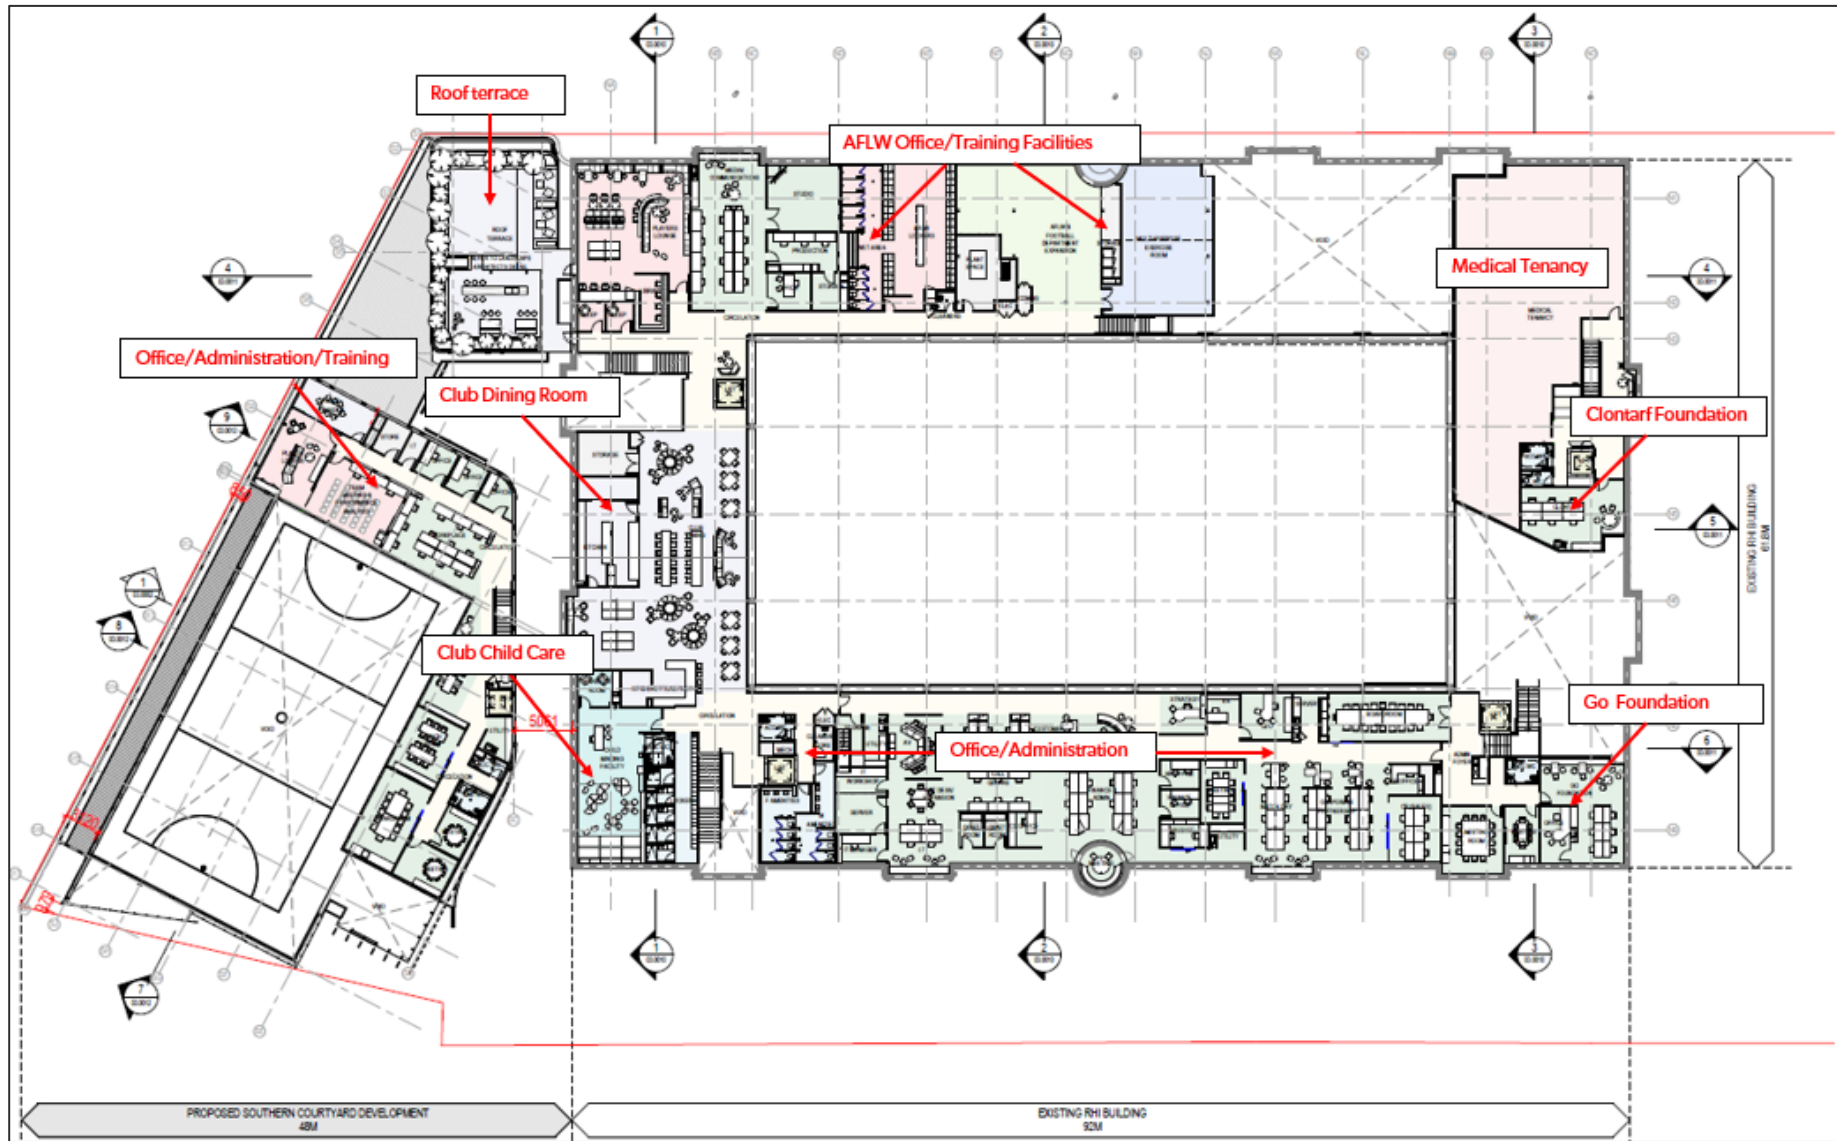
| First floor plan (Base source: Applicant's Architectural Plans)
